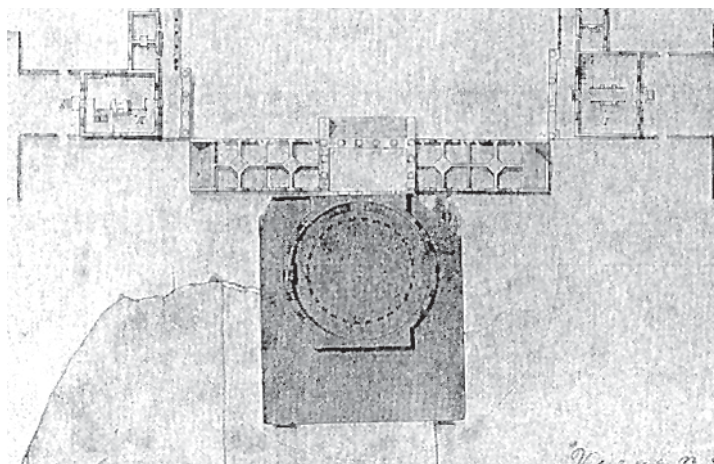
John Neilson plan of the ground floor of the Lawn, with an overlay of the plan for the Dome Room, November 1821 (detail below). [Virginia State Library and Archives, Richmond]
